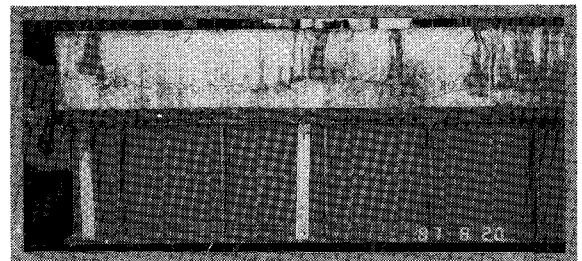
Cracks after Galvanostatic Corrosion at Side Surface.
